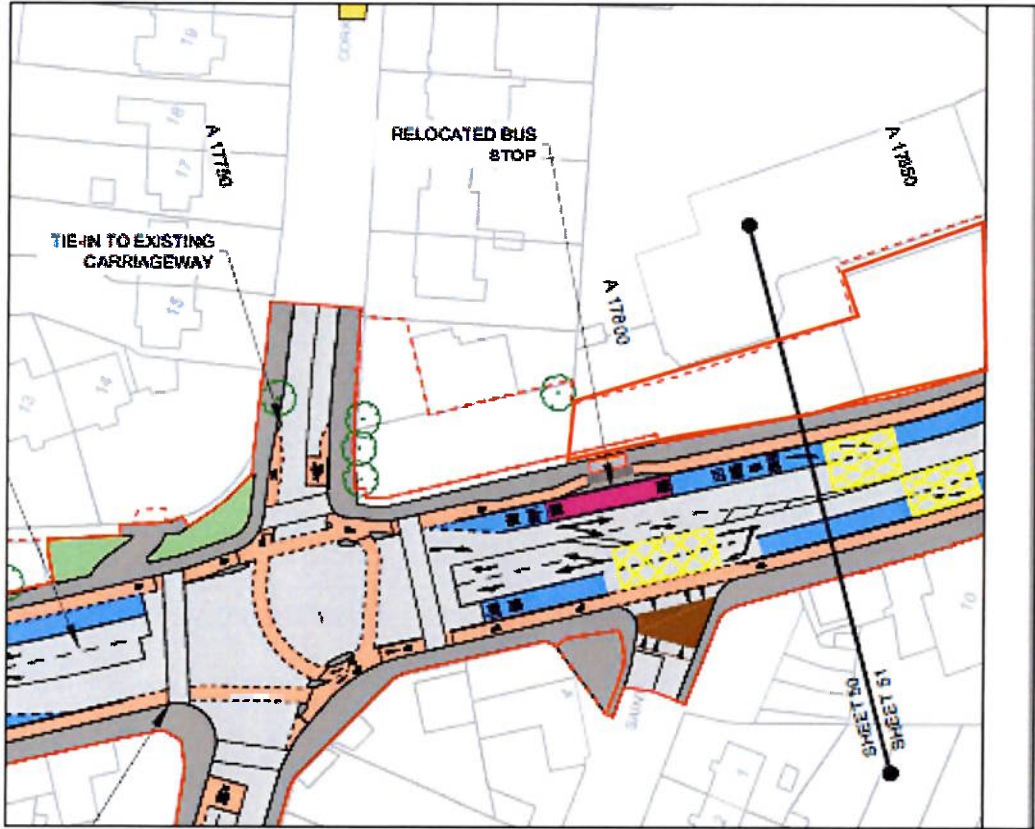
Scheme Plan for Bray, subject site generally outlined in red - West Side - (Source: Jacobs, 2023).
